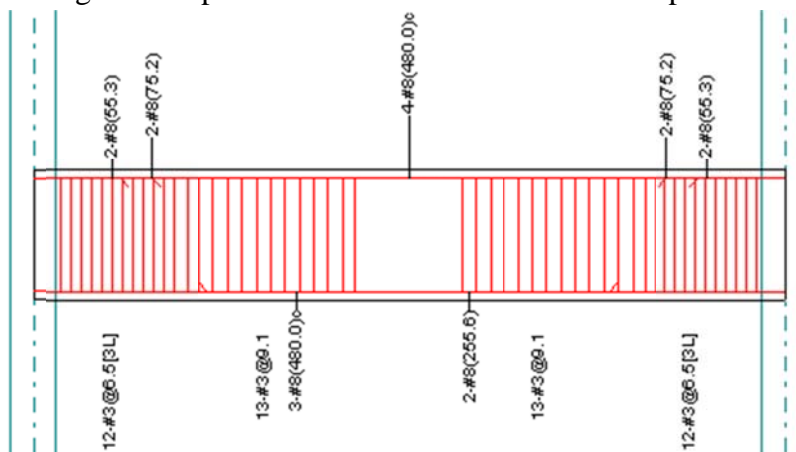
spBeam Column Line B.1 Reinforcing Diagram
